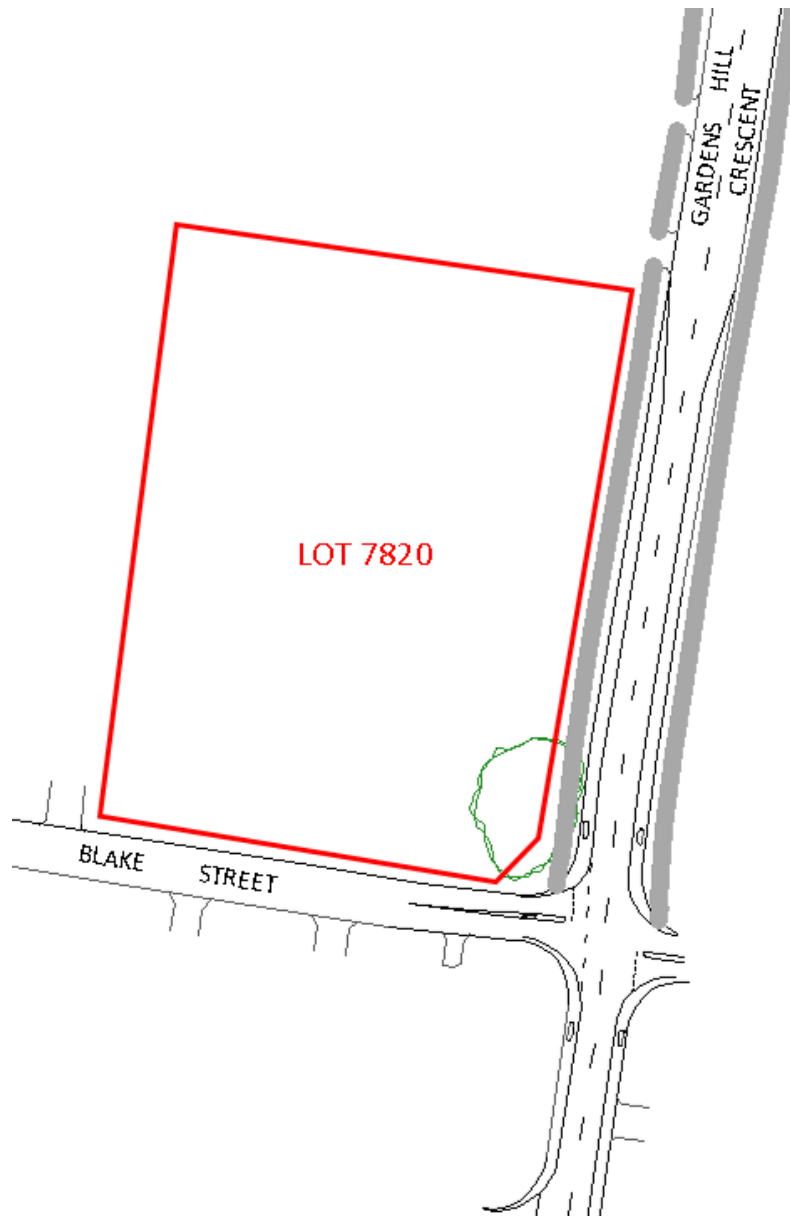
Existing layout of Blake St & Gardens Hill Cr adjacent to development site
